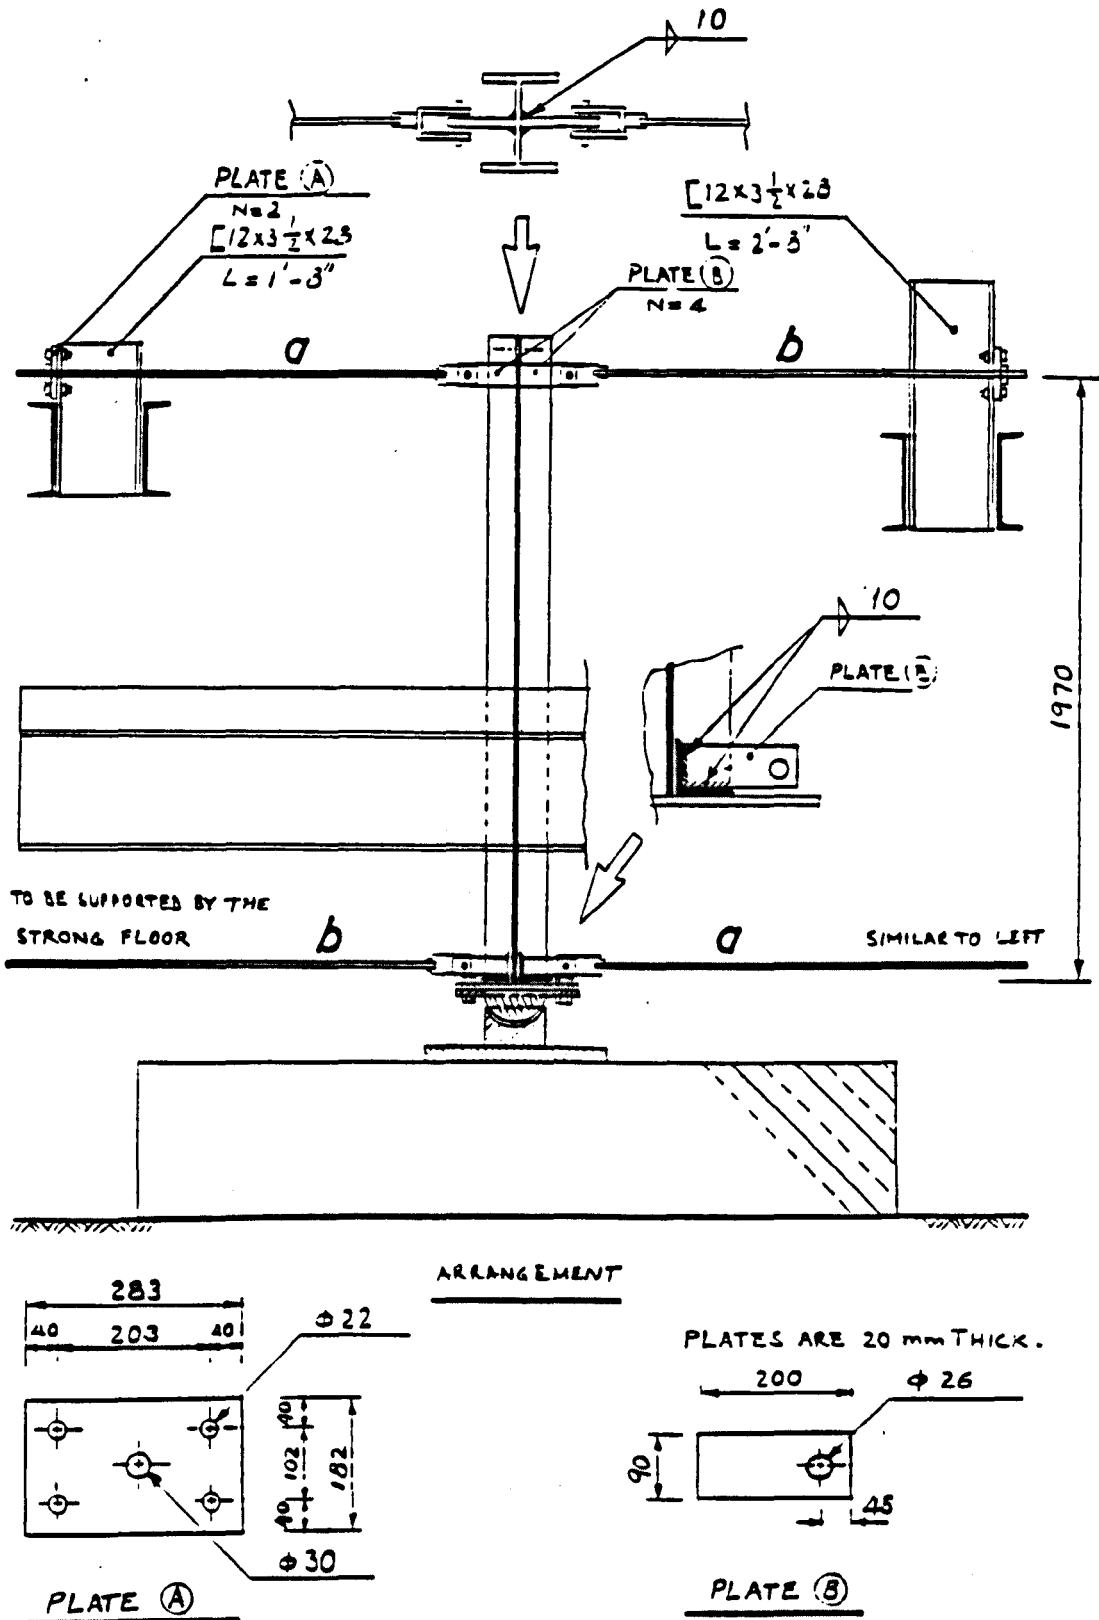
, Arrangement of tie bars, either (a) or (b) was used
